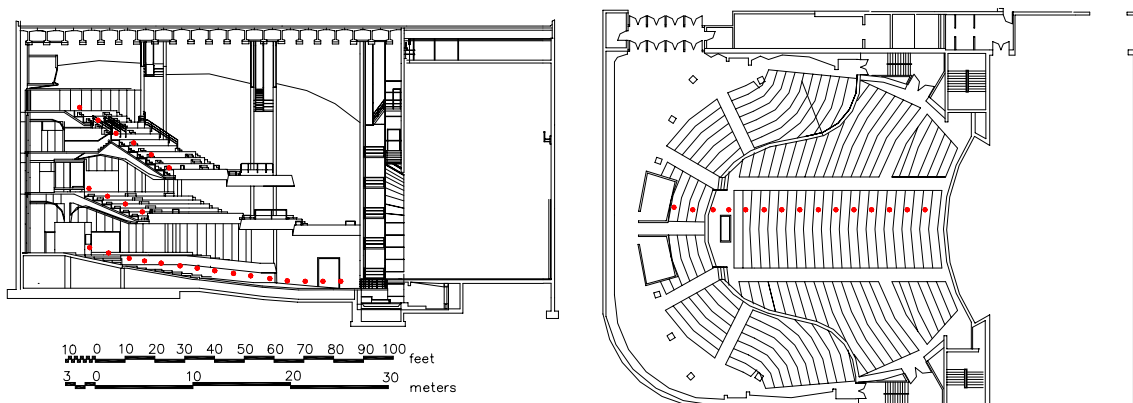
Plan and section of Silva Concert Hall. Measurement positions are indicated by small dots. An orchestra shell in place for the measurements is not shown in the drawings.
